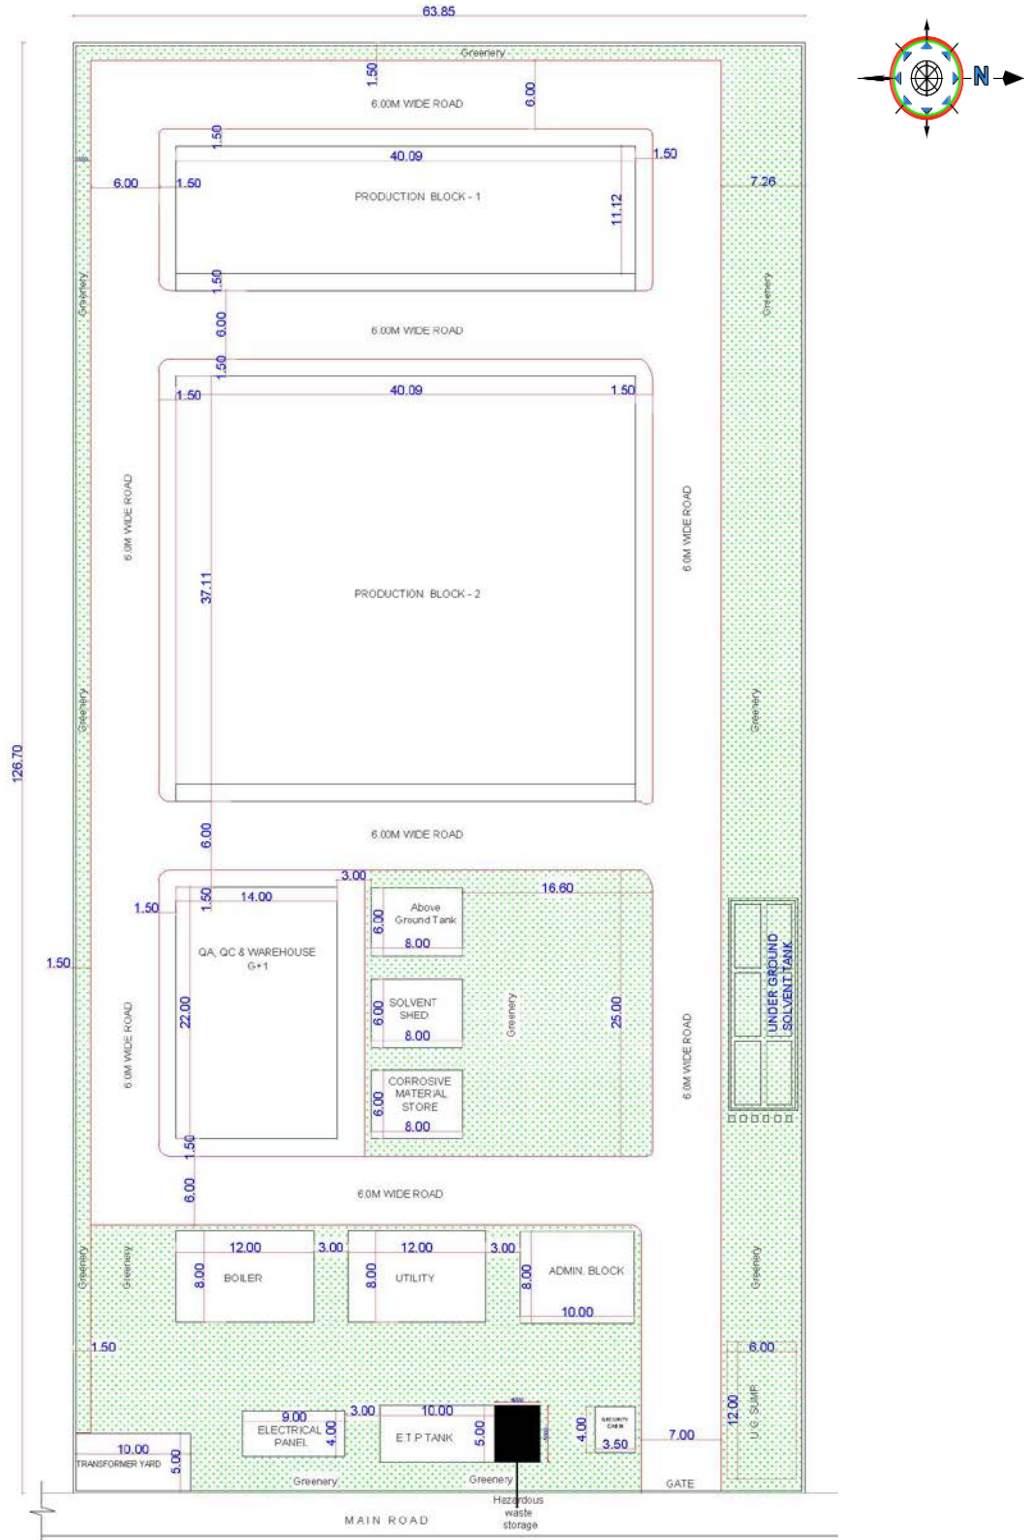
LAYOUT PLAN OF THE PROPOSED PROJECT SITE
